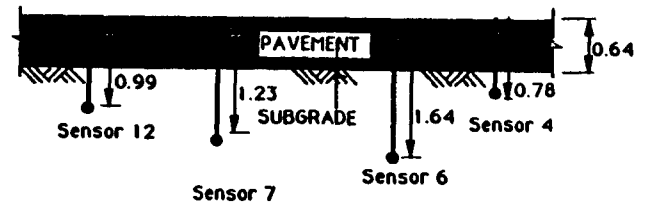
(a): INSTRUMENTATION LAYOUT
